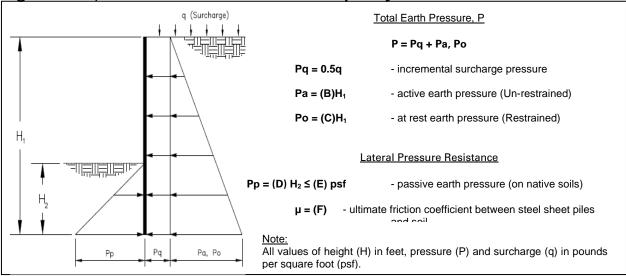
, Lateral Earth Pressures on Temporary Cantilever Wall
